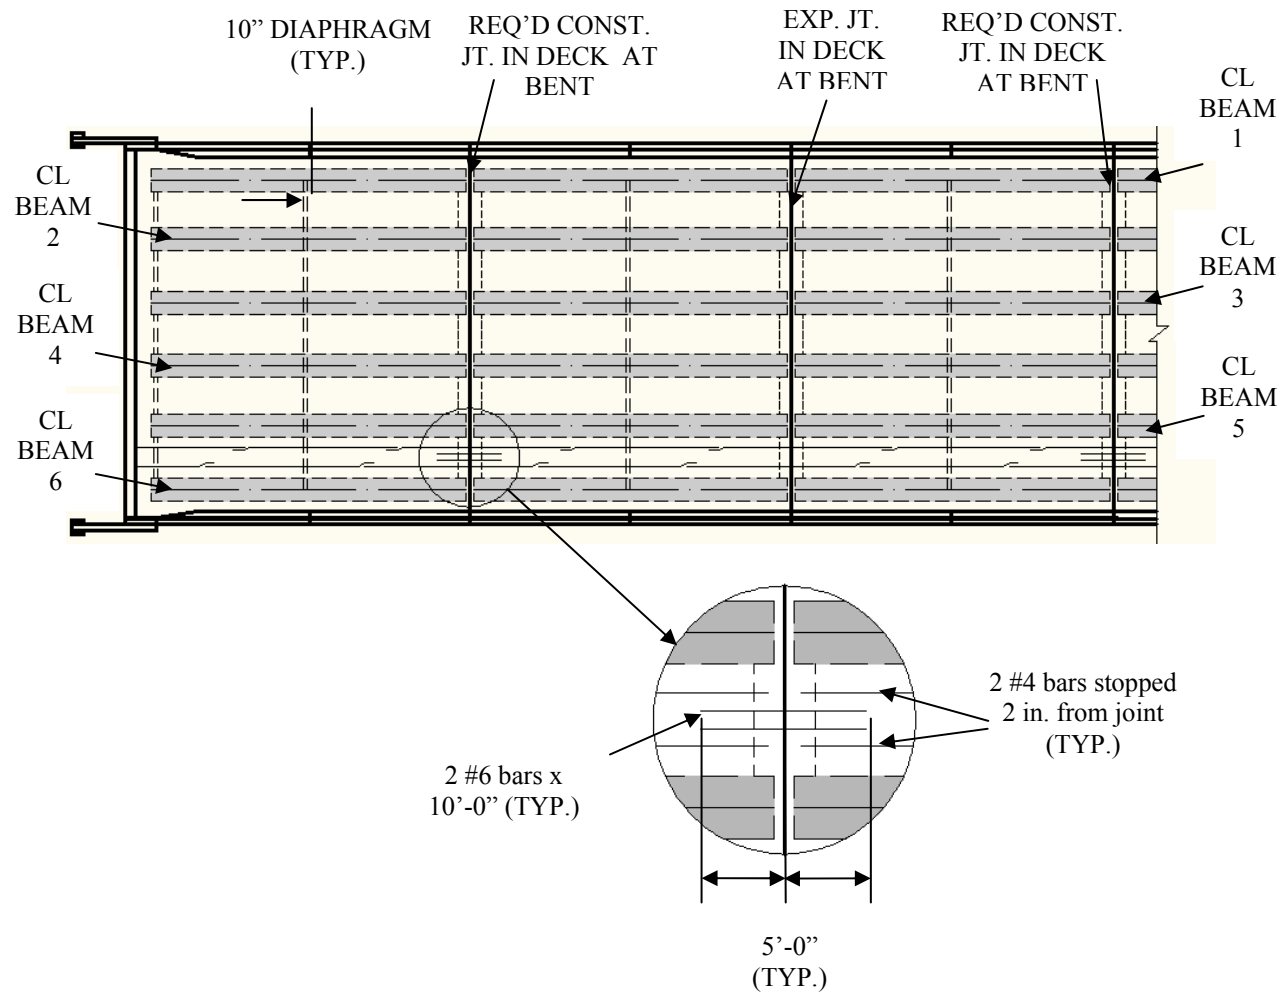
Plan view of current continuous bridge deck (modified from GDOT SR 46 Over Oconee R. plan)
